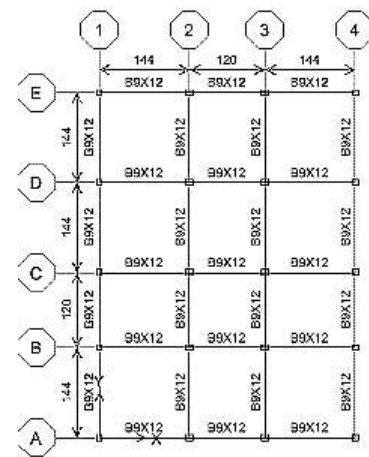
Roof beam section plan of proposed building for T-2 (in)
